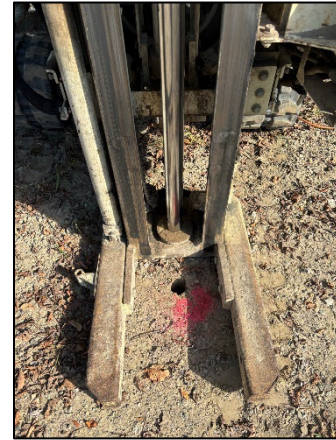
Viewing 11944 SB01 Drilling, Facing Northeast.
